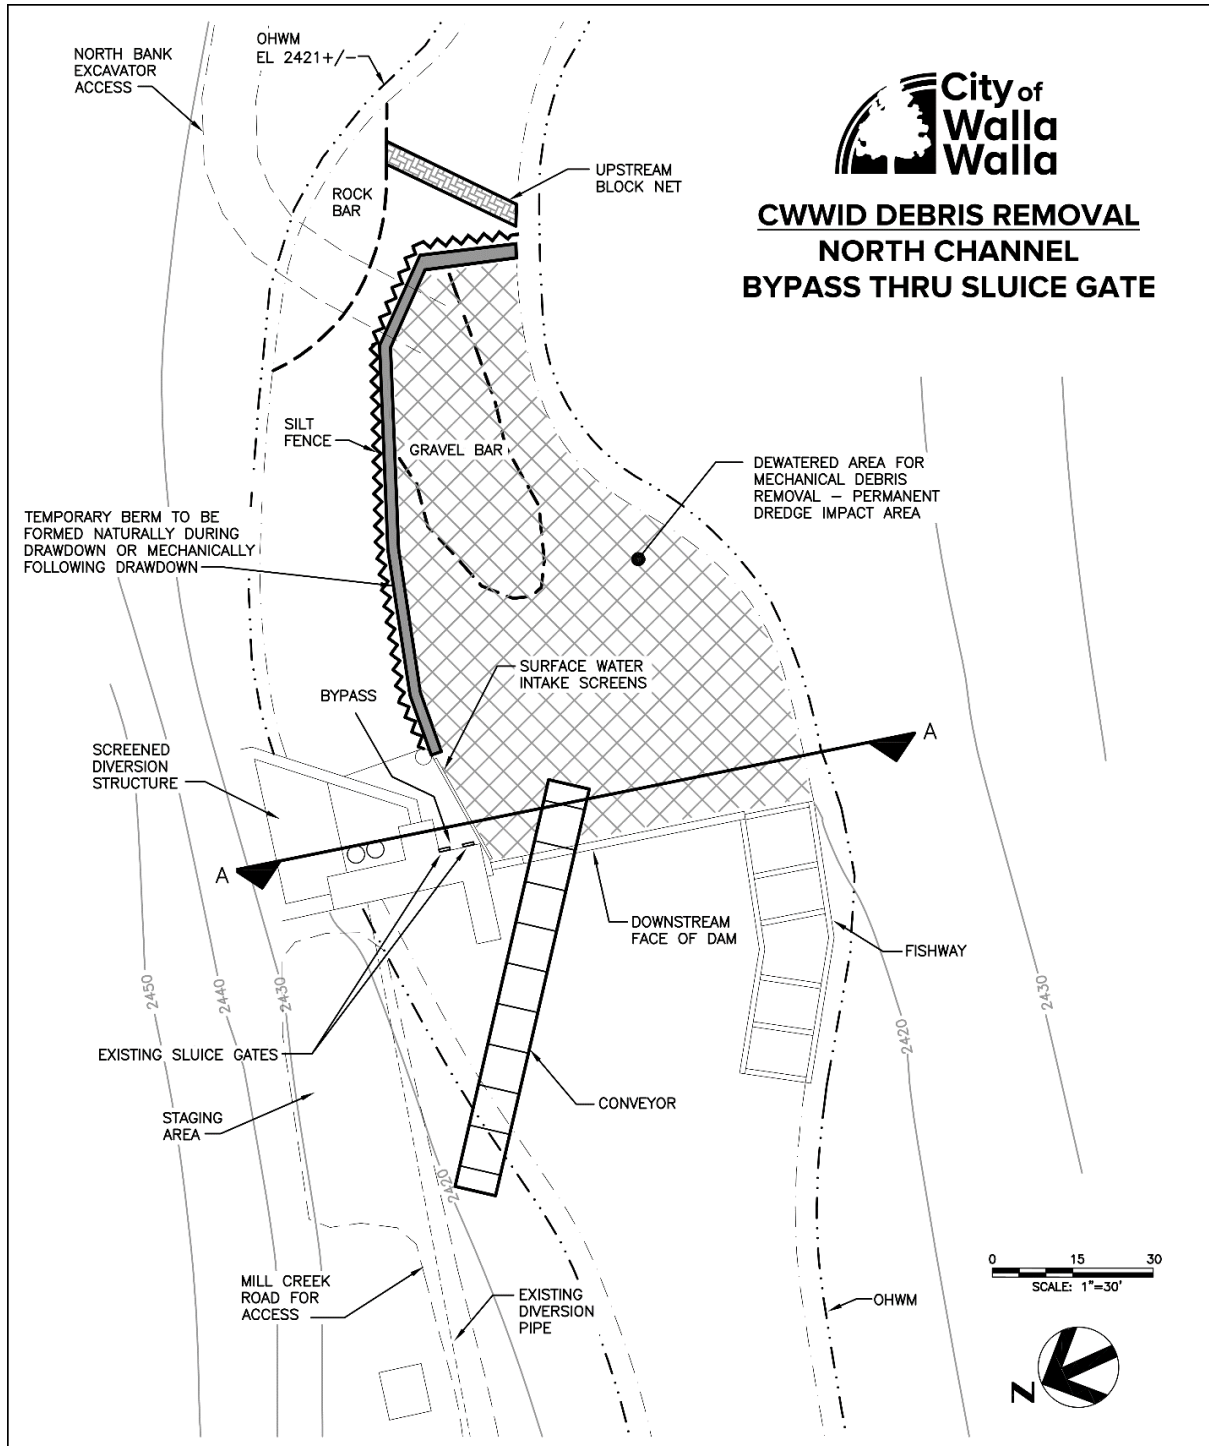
Instream debris removal project, showing dewatered area and north bank bypass concept.
